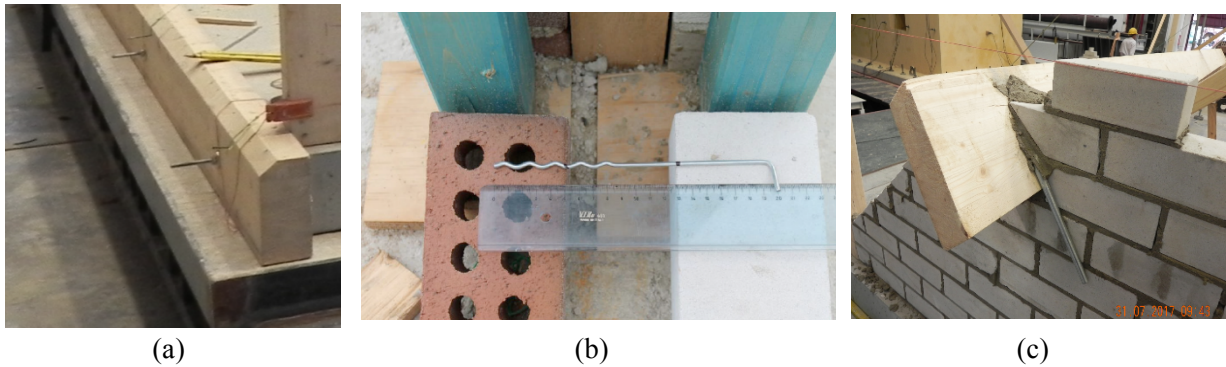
RC slab/beam connection (a), steel ties (b) and L-shaped anchors (c) (Correia et al., 2017)
